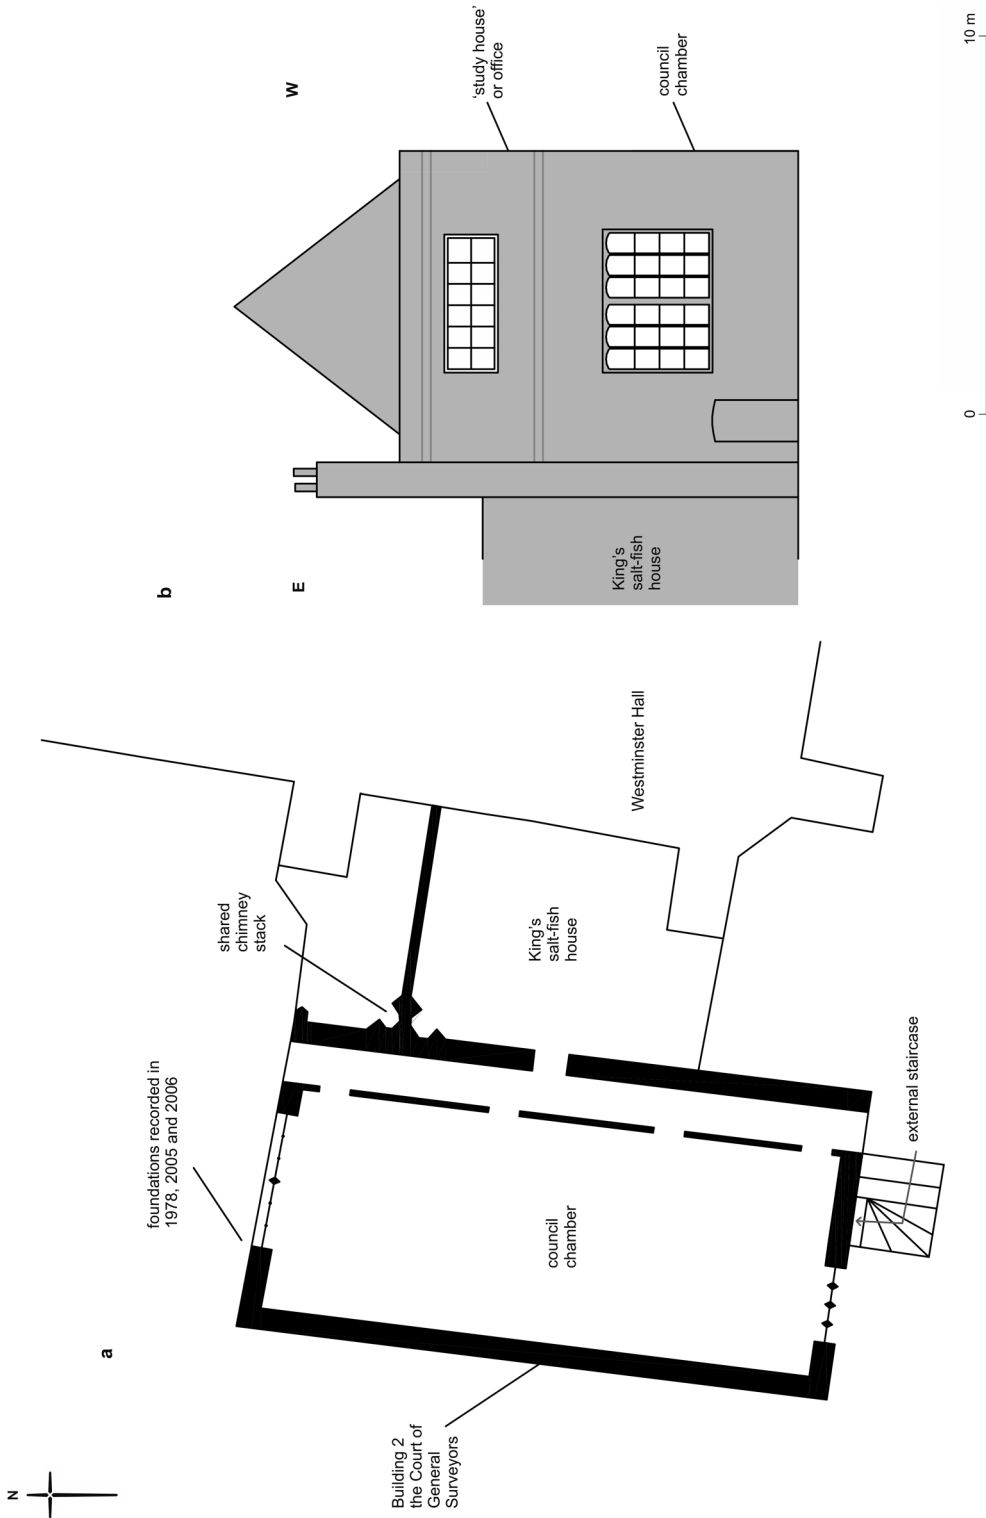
Reconstruction of: (a) the plan and (b) the north elevation of the Court of General Surveyors (scale 1:200)
